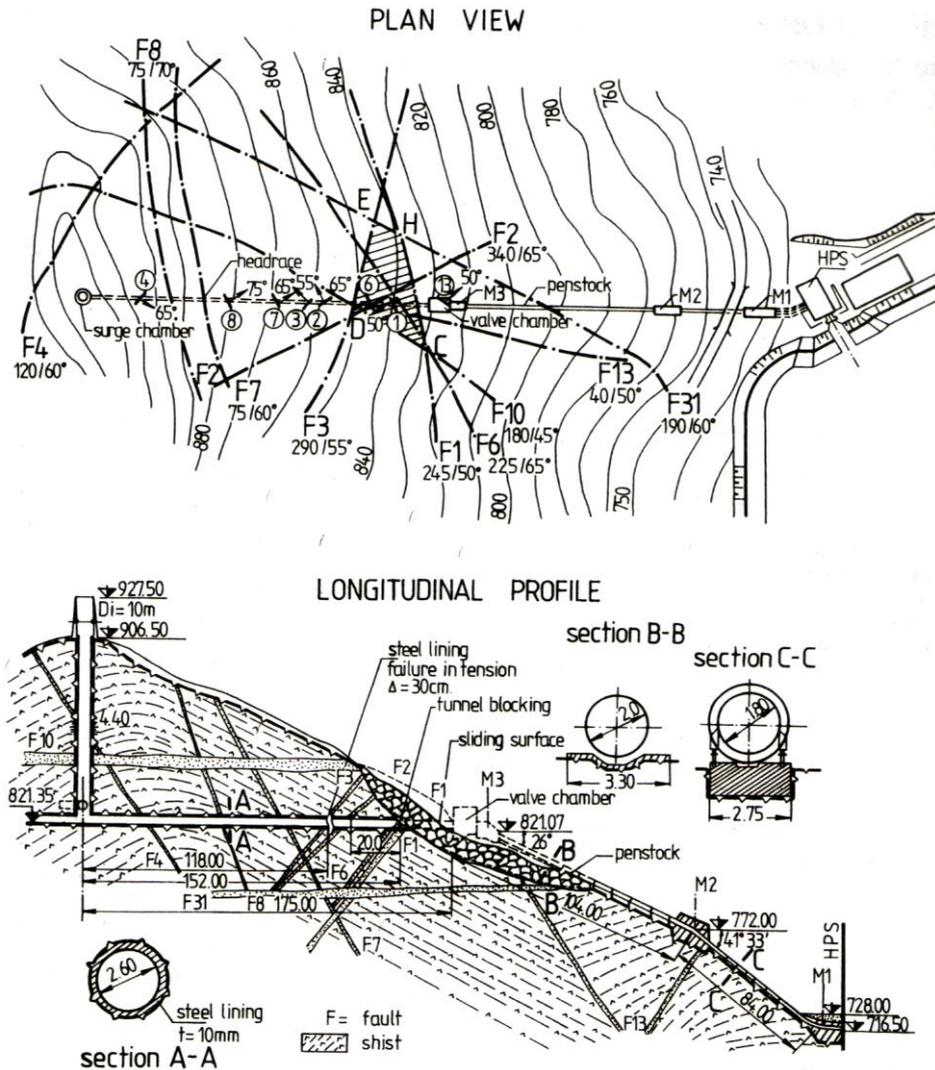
Hydraulic circuit of Leresti powerplant: site geology and affected works
